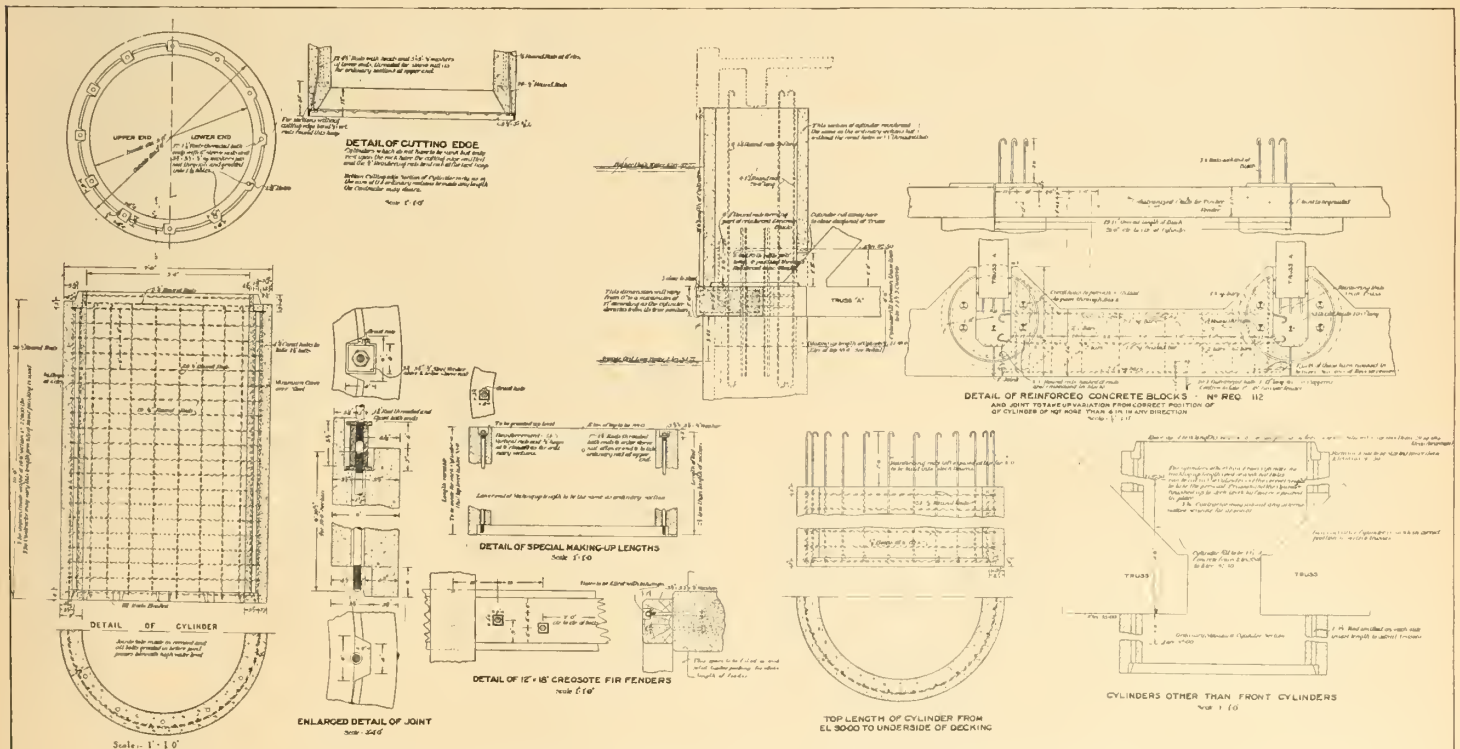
Ballantyne Pier Details of Cylinders and Fender Beams.
